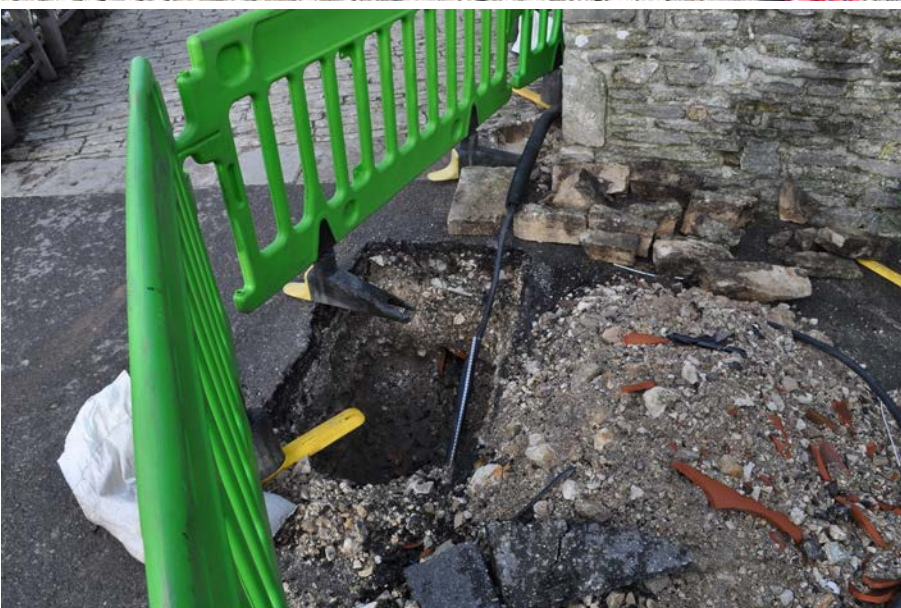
View of trench previously dug to repair electricity cable, showing deposits south of Outer Bridge. Looking NNW.
